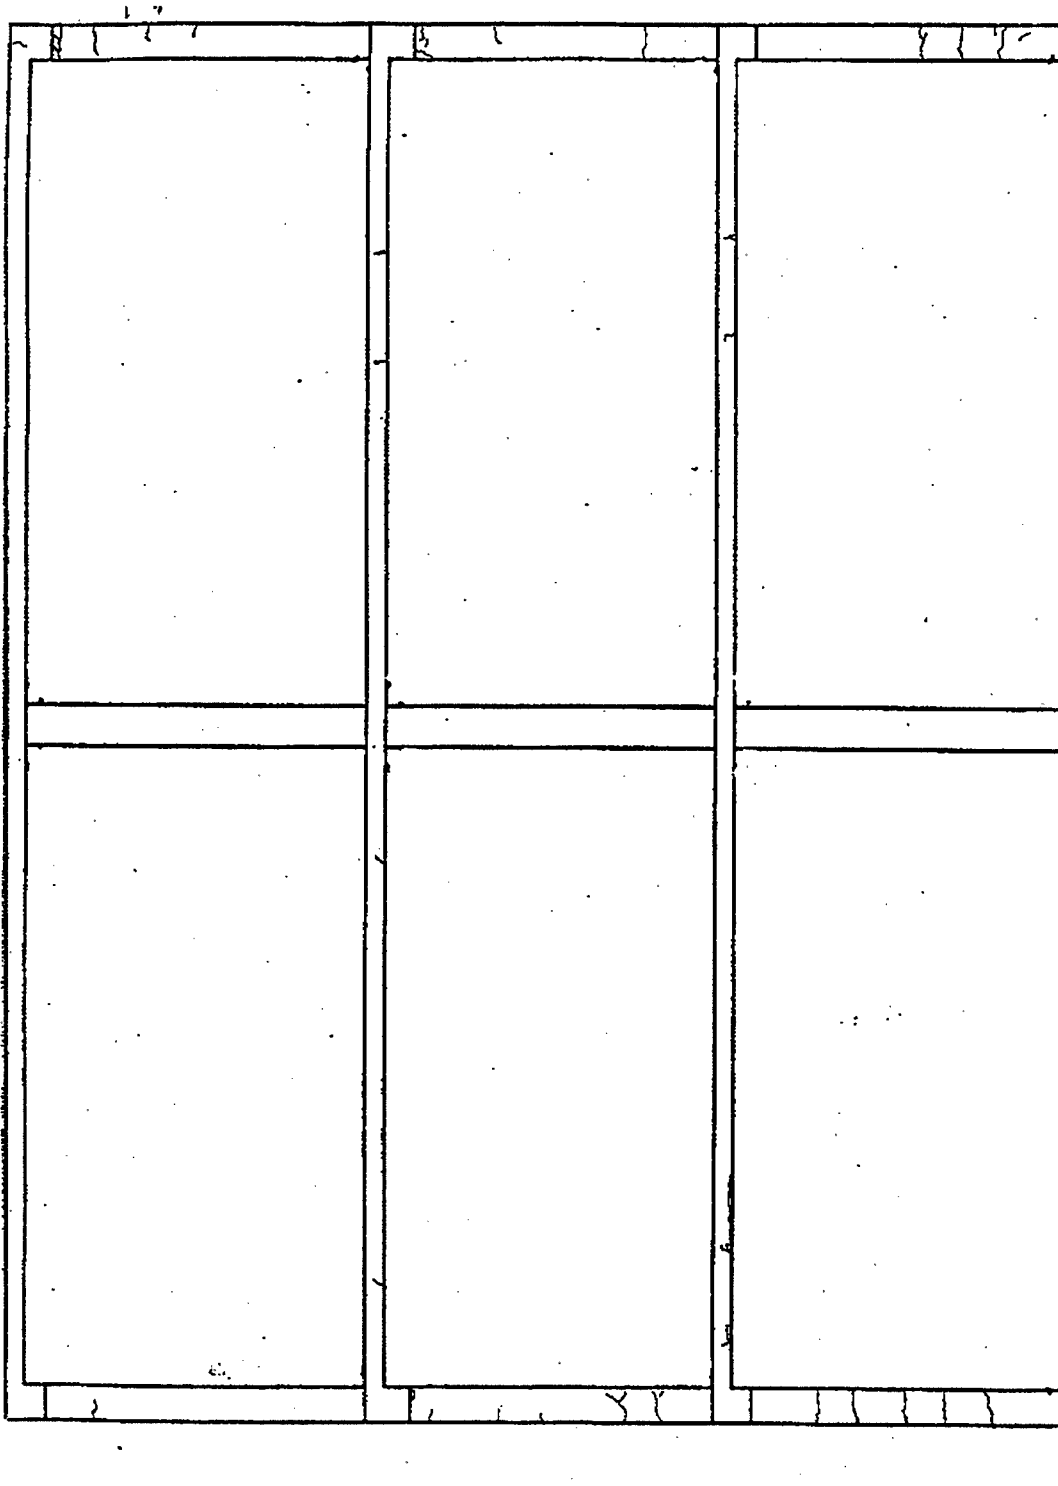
Crack Pattern, West Side of West Columns, Post-T420DL
